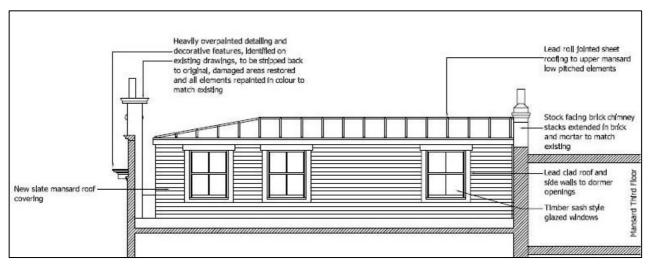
(above): Approved proposed detailed design of mansard behind the parapet.
